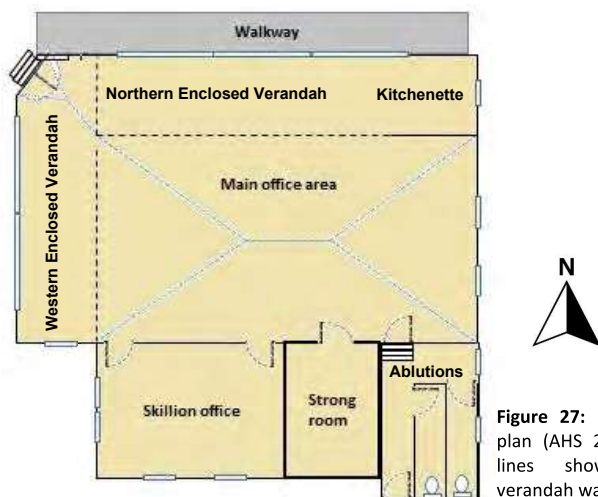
Internal floor plan (AHS 2016) [dotted lines show removed verandah walls]
